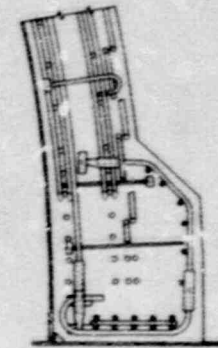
Cylinder Stretchout - Reinforcement Layer 8
